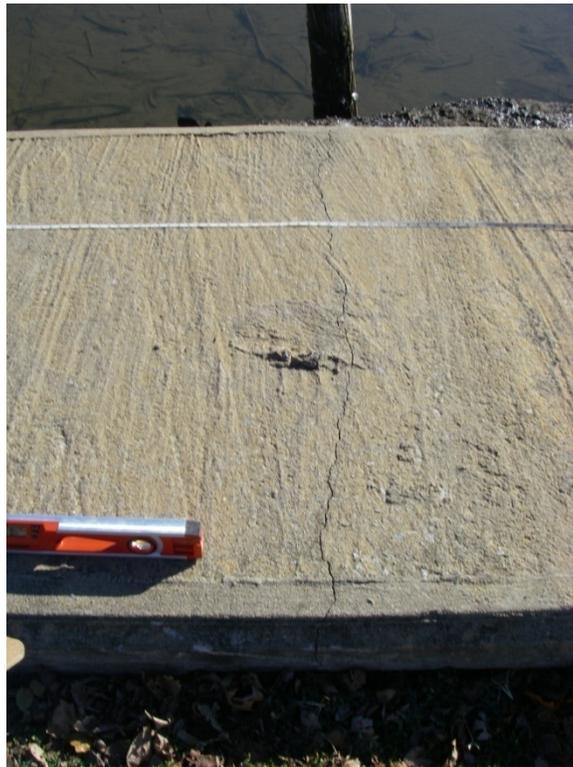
Full Width Medium Crack in Slab 6
